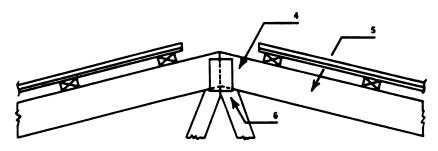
Location of test sites, Barn G. Truss No. 2, 29.2m (104') from east end. East elevation. Flashing not shown.
